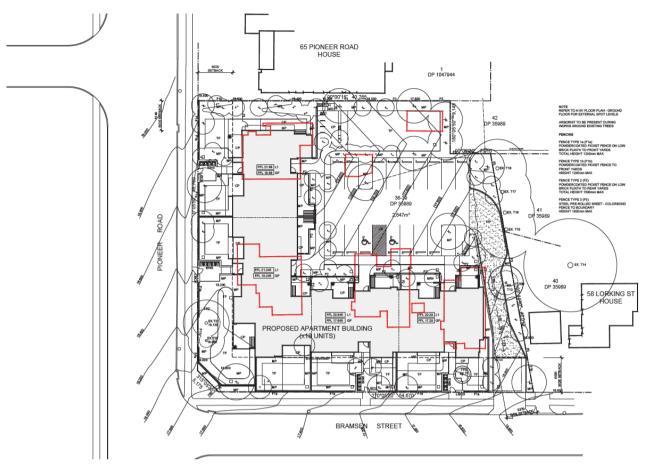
Extract of site plan (Source: McIntosh and Phelps)
